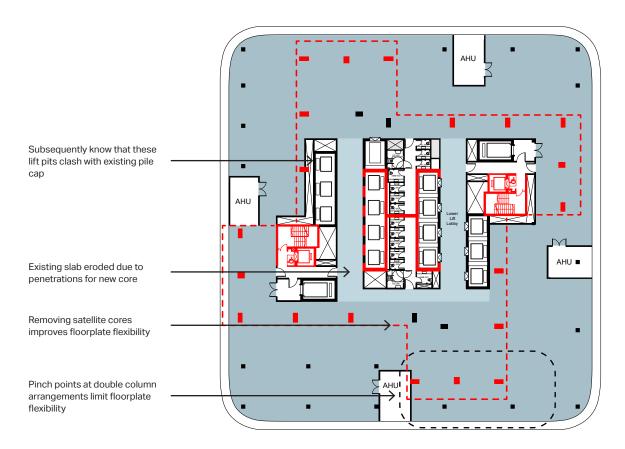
Indicative floorplate and core layout with all new core elements located around the existing central core and satellite cores in the existing floor slab
